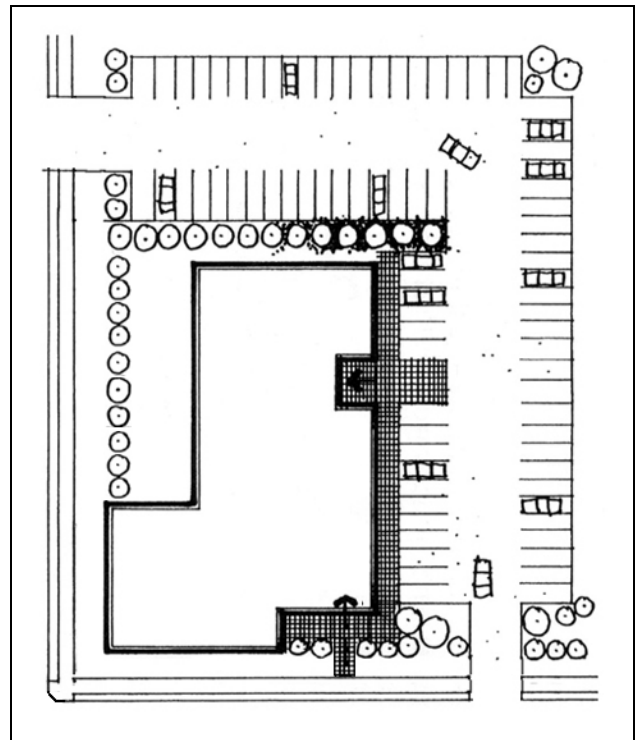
Parking areas should be located at the side and rear of buildings.
